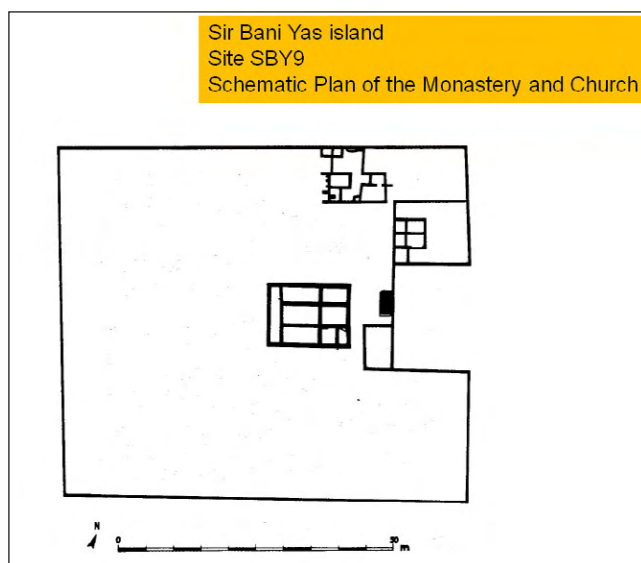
Site 9, Schematic plan of the Monastery and Church (Source : ADIAS).
